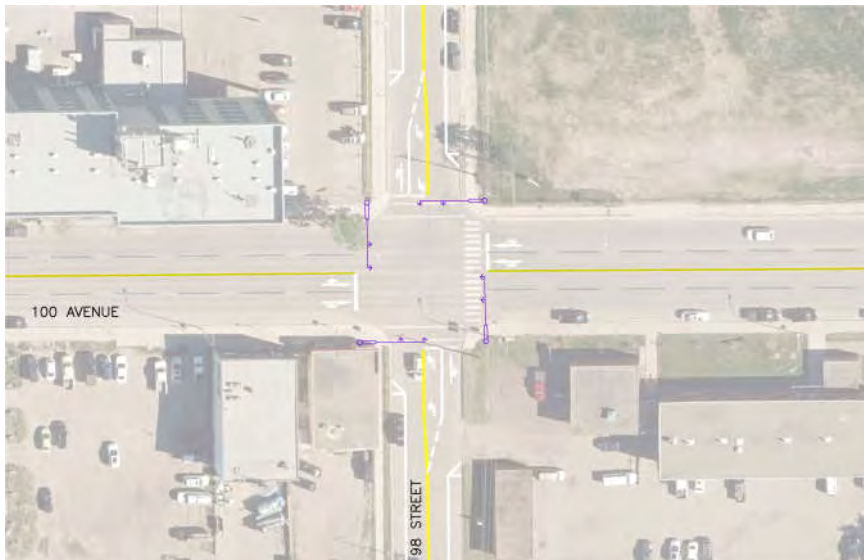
Proposed upgrades to 98 Street at 100 Avenue intersection
